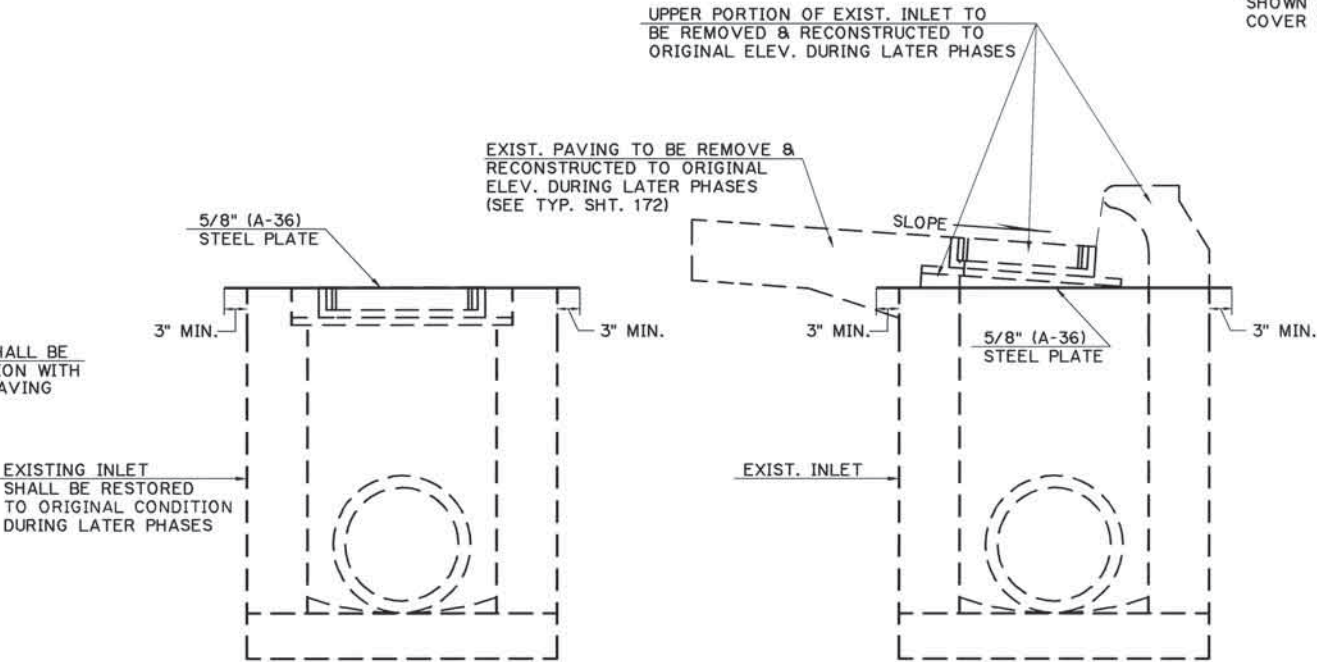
DETAIL OF PROPOSED INLET CONSTRUCTION DURING DETOUR PHASING
